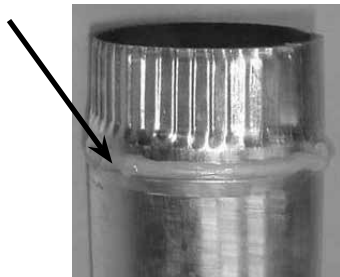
STEPS (for Commercial/Industrial Installations) to Join Double-Wall (Type B) Pipe to Single-Wall Vent Pipe Run
